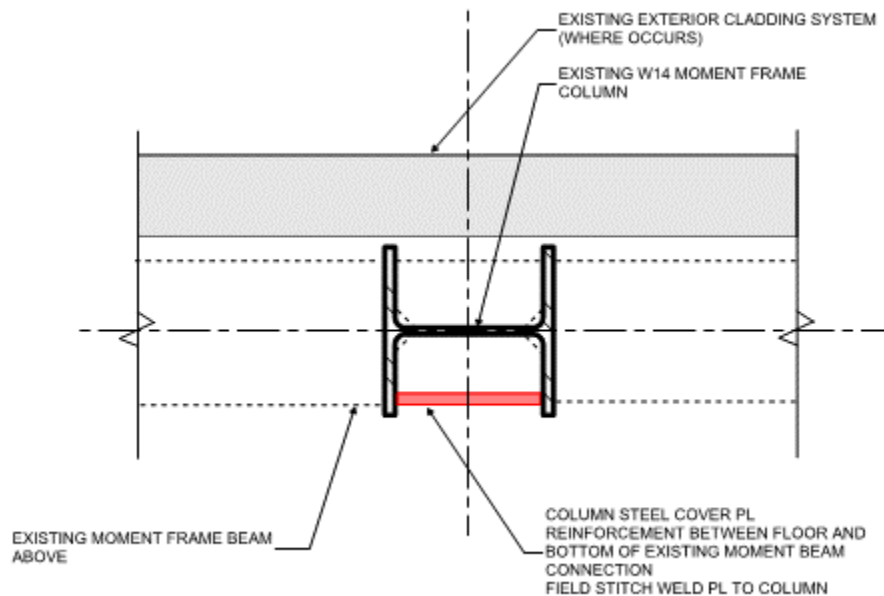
Moment Frame Column Cover Plate Reinforcement
